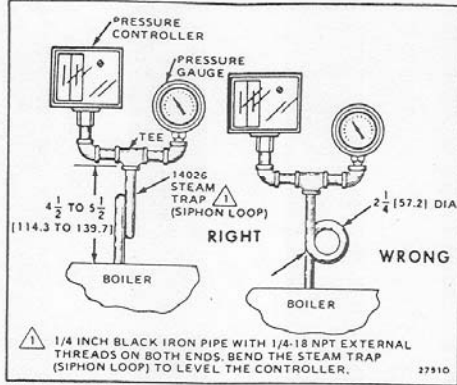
RIGHT AND WRONG MOUNTING OF A STEAM TRAP (SIPHON LOOP), WITH APPROXIMATE DIMENSIONS IN INCHES [MILLIMETRES IN BRACKETS].
